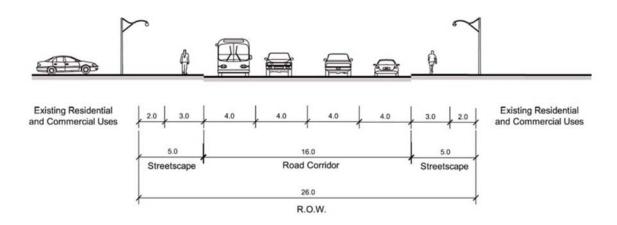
THE QUEENSWAY, KSP EXISTING CROSS-SECTION (PINE BEACH DRIVE TO MORTON AVENUE)
